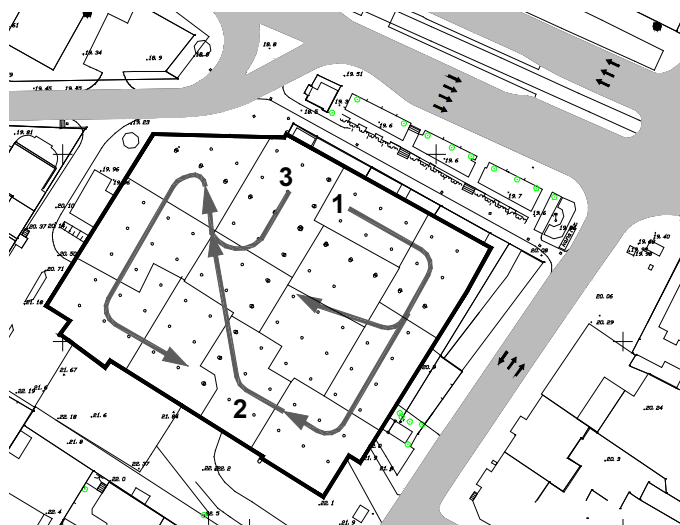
Excavation layout with the sequence of deepening under the floor “-1”
